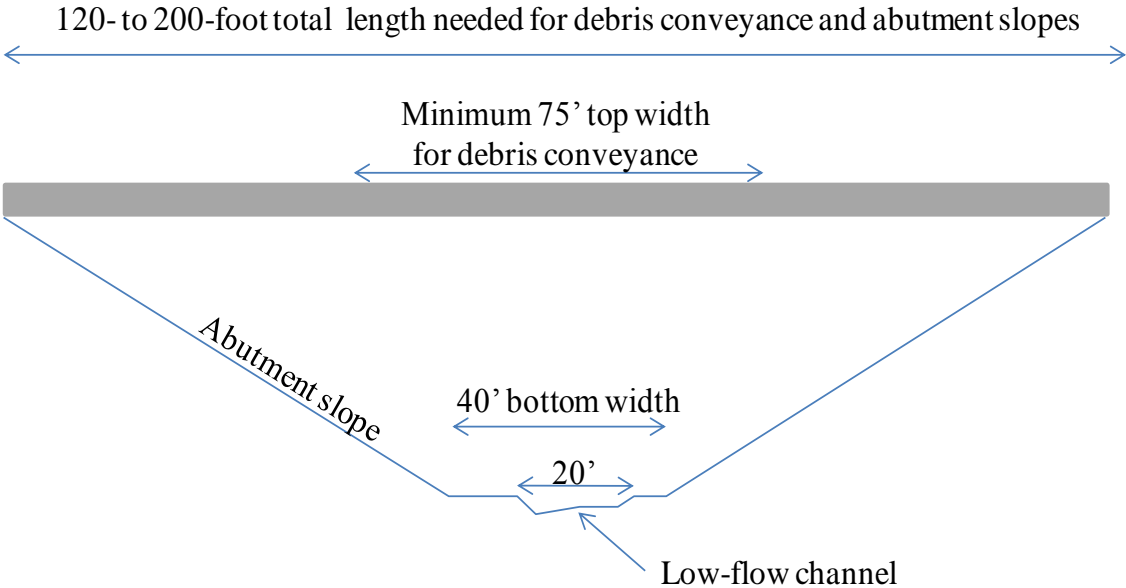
Conceptual Cross Section of the Recommended Bridge Opening.
